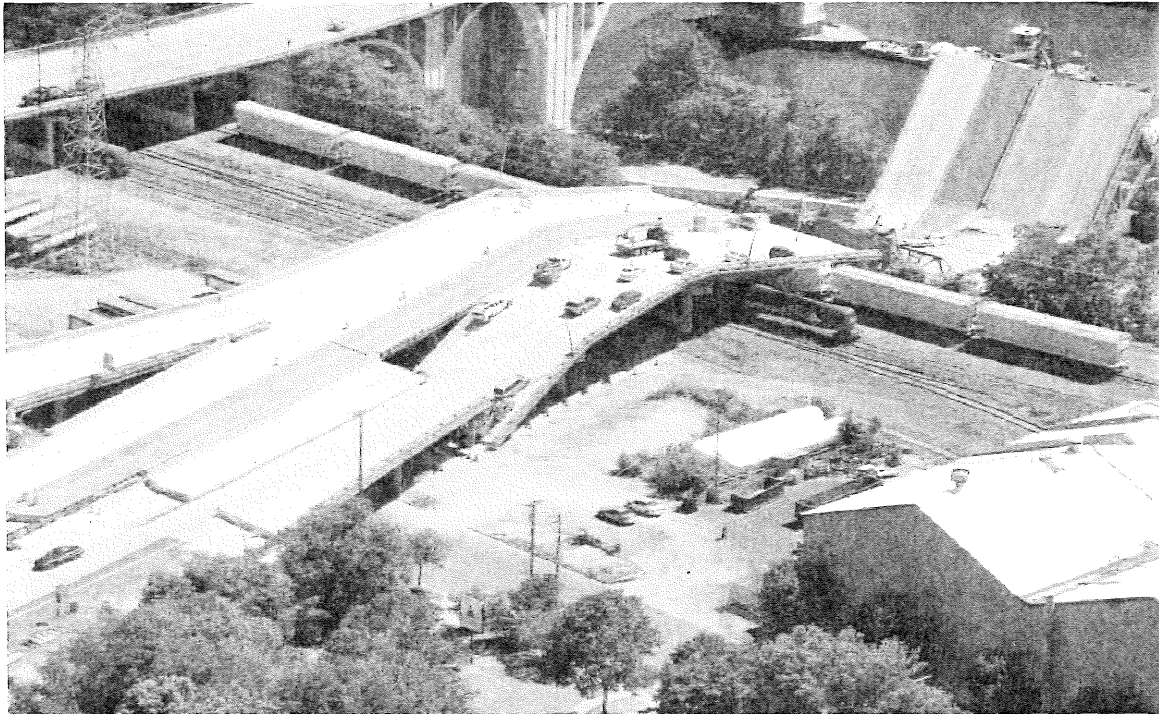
Post-collapse view of north approach spans looking southeast.
